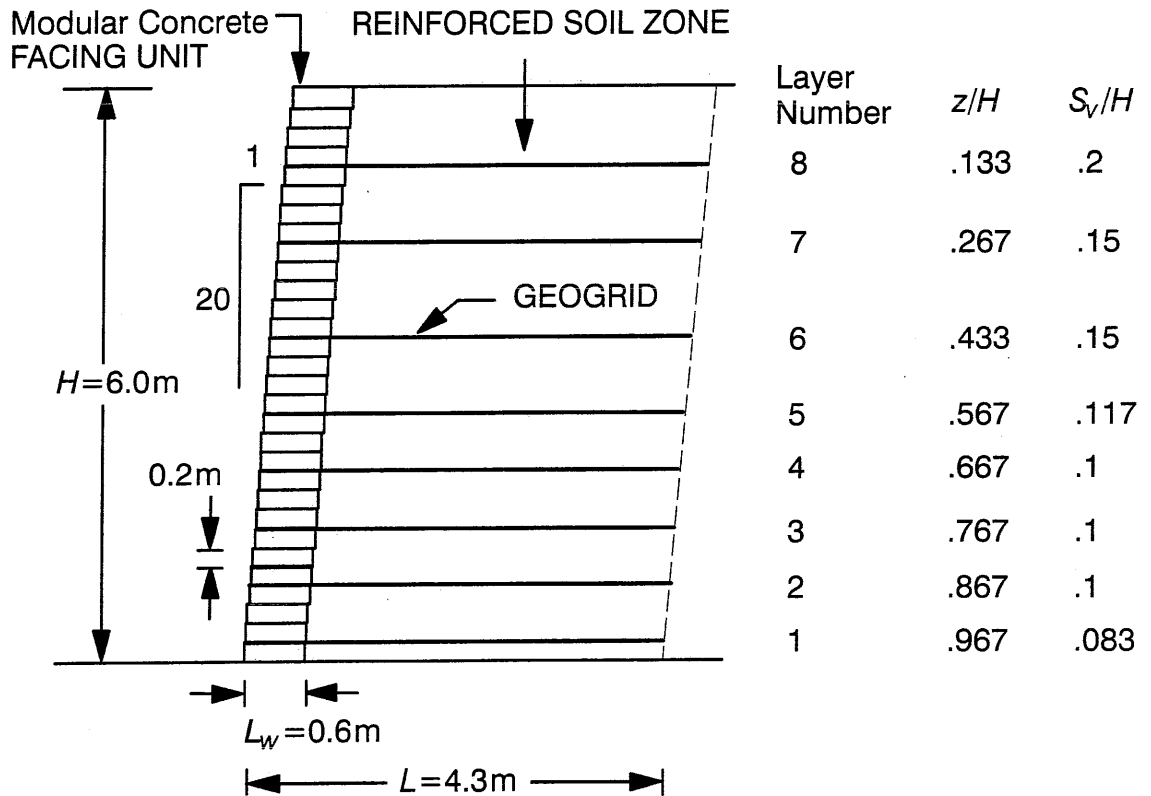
Example geosynthetic-reinforced segmental soil retaining wall (after Bathurst et al. 1993b).
